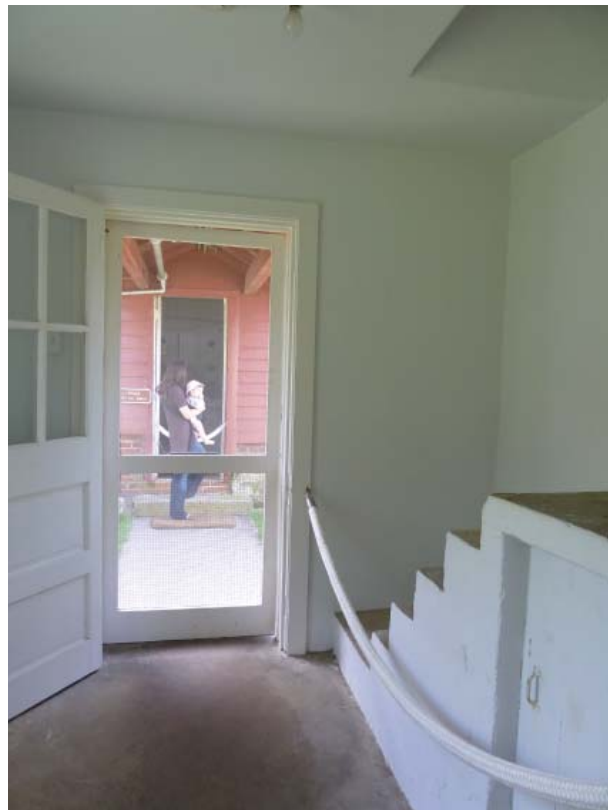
Milk House: Room 101 - Entrance Room looking south through main entrance screen door to Milk Parlor entrance.
